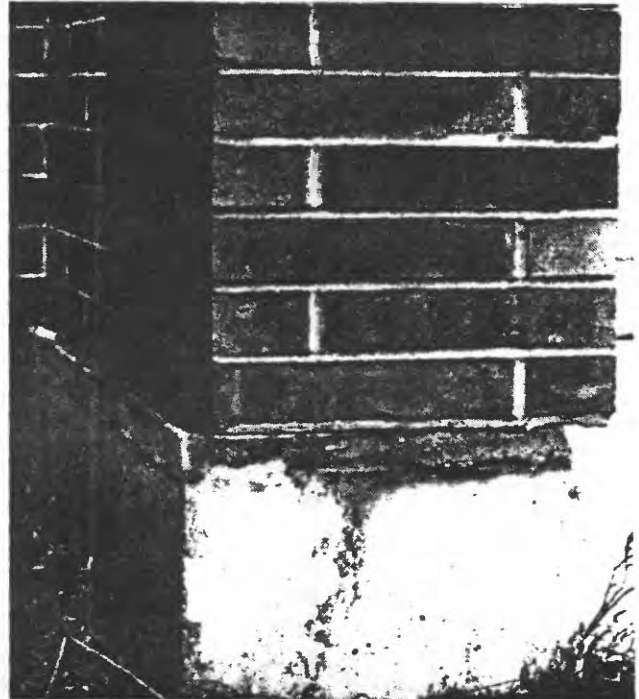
Movement of pilaster past foundation due to expansion of a long wall to the left in the photo.
